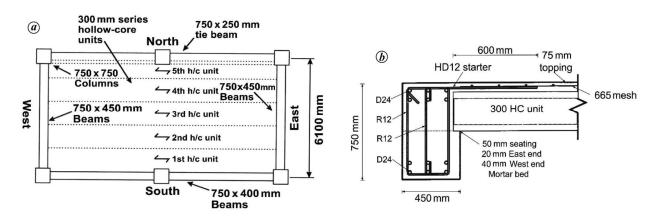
Details of super-assemblage⁴⁵: *a*, Plan; *b*, Connection detail.
